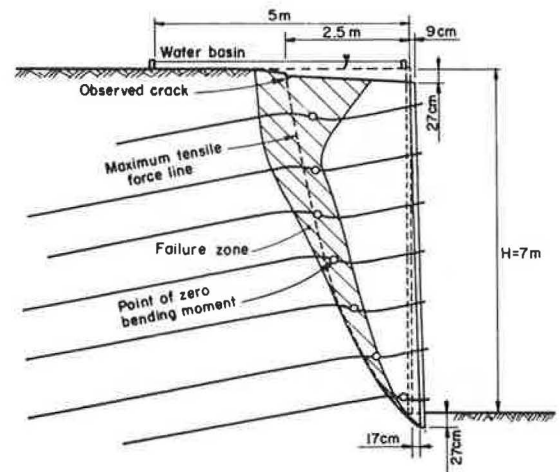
Failure zone developed in full-scale experiment on nailed soil wall.
